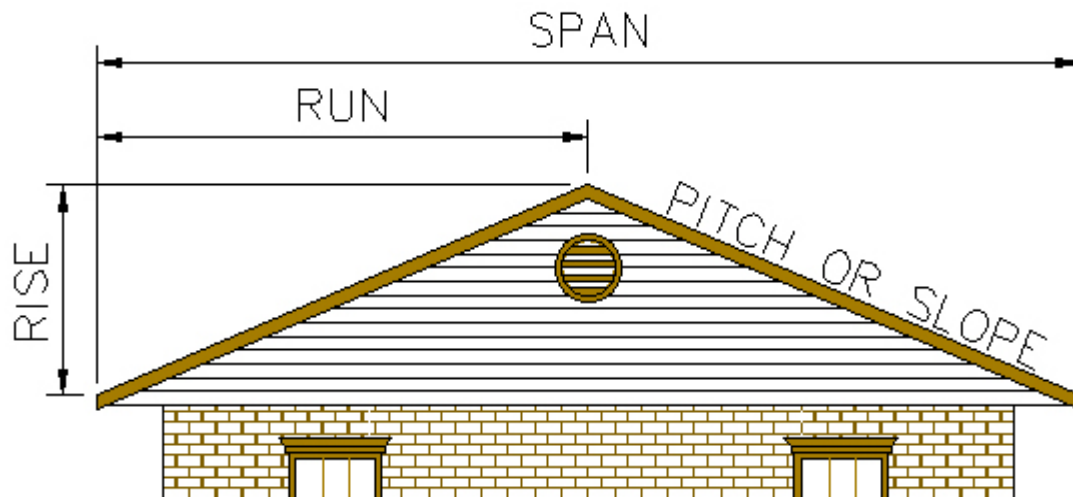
Building roof geometry. Source: Roofing Calculator (2015).
